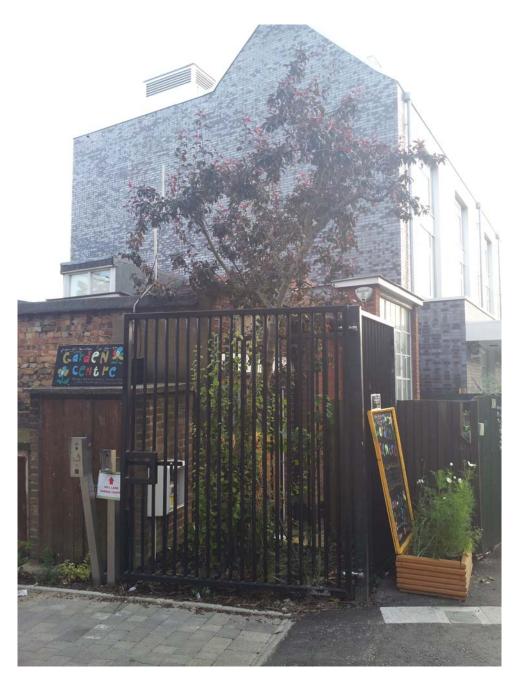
Laneway Entrance - Existing tree and metre boxes (Site in foreground and school building in the background)
